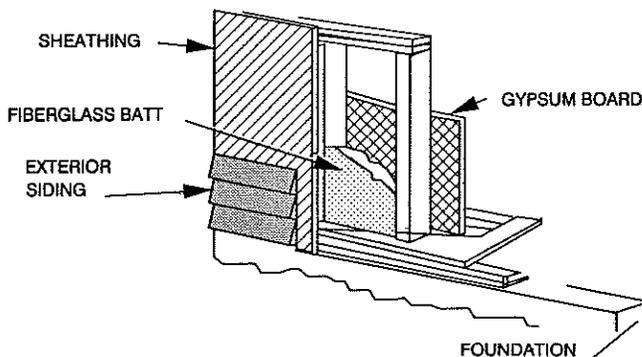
Cutaway diagram of wood-frame cavity wall construction.
